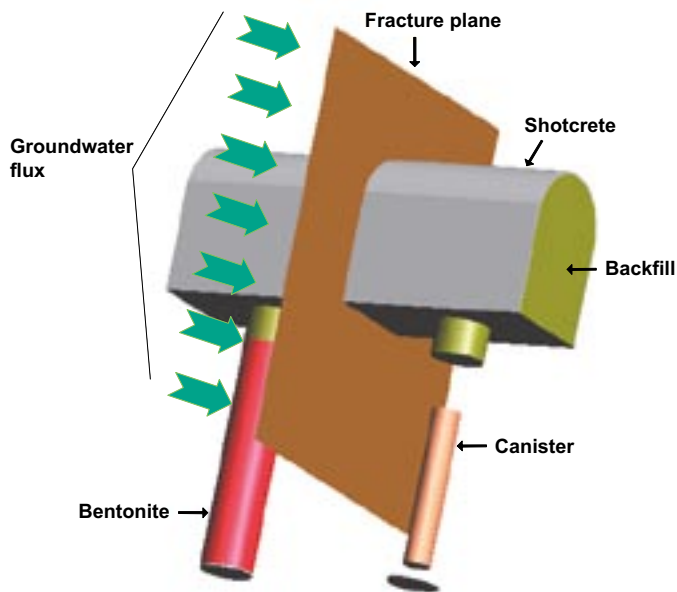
Configuration of the SKB concept for spent fuel storage at depth, showing a hypothetical fracture intersecting the deposition tunnel. A layer of shotcrete applied on the inner part of the excavation has also been considered.
